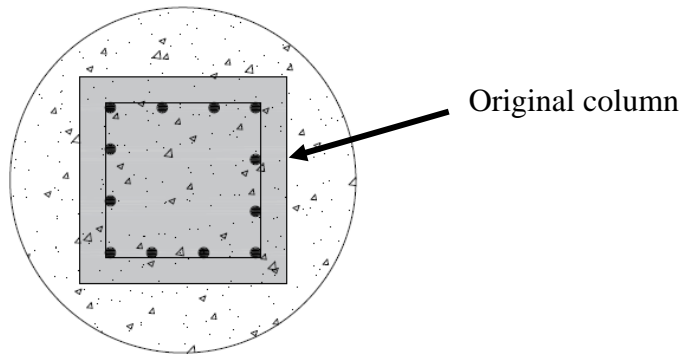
Circular concrete jackets on square reinforced concrete columns
